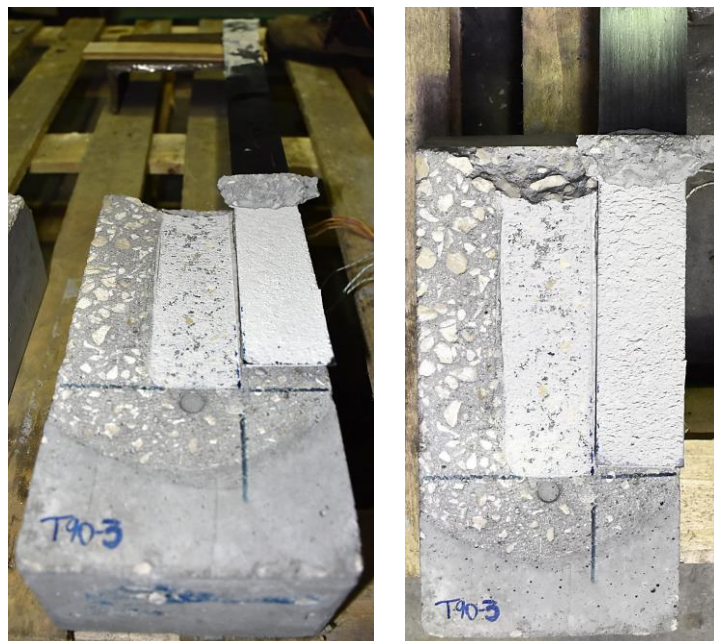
Failure mode in the adhesive at the CFRP-concrete interface for the T90-3 specimen tested at 90° C (perspective view on the left and front view on the right)
